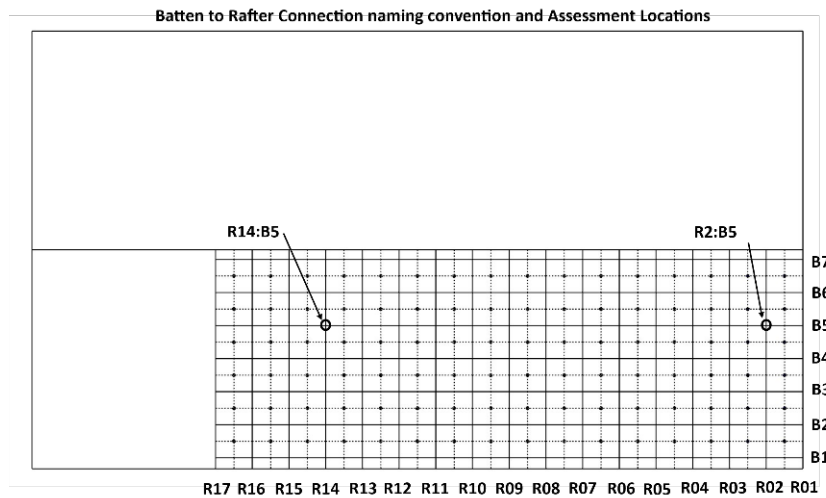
Batten to Rafter Connection Locations and Naming Convention
